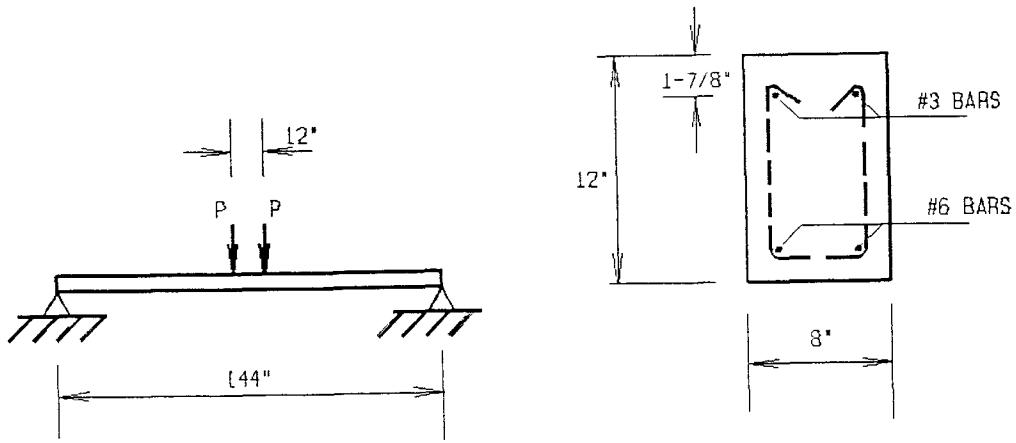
LOADING ARRANGEMENT AND CROSS SECTION OF BEAM 10, 11
